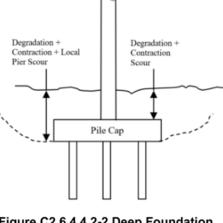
Deep Foundation Location Figure 1
